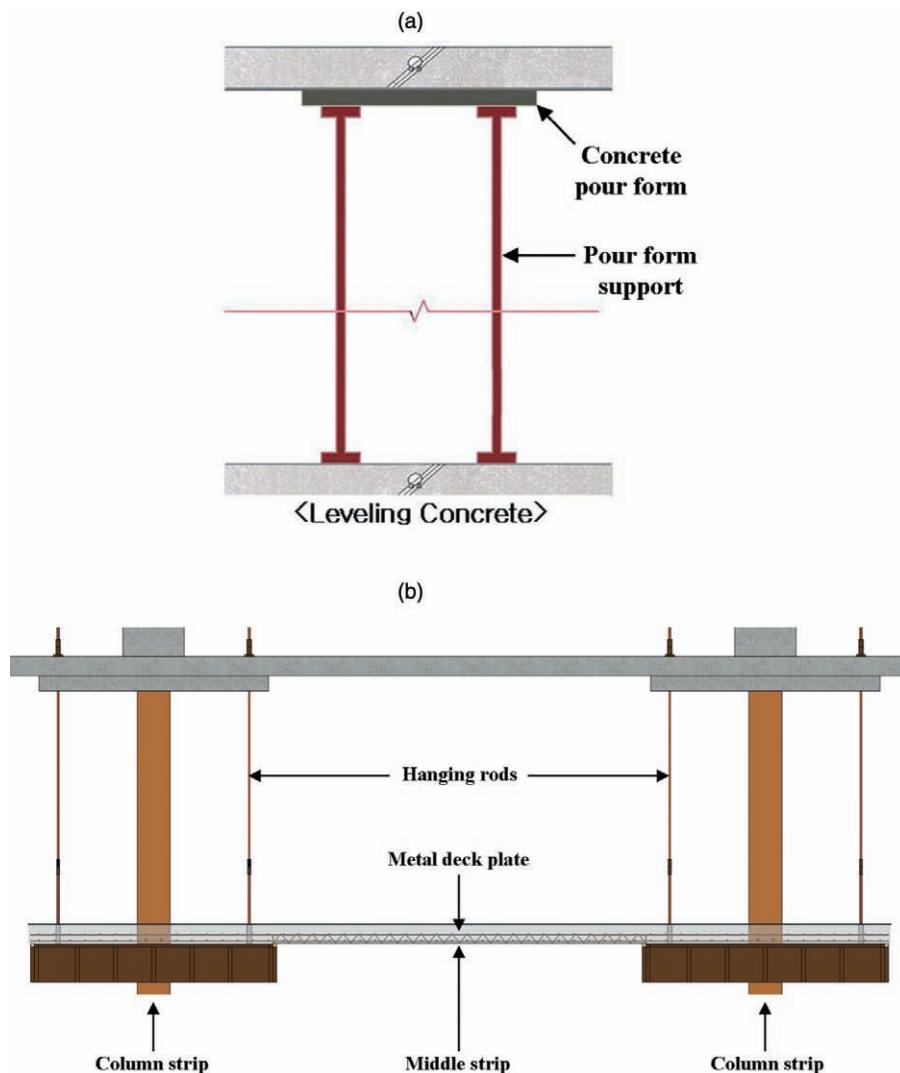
Advantage of the new technique. (a) Support system. (b) Modularized reinforced concrete system downward hanging system
